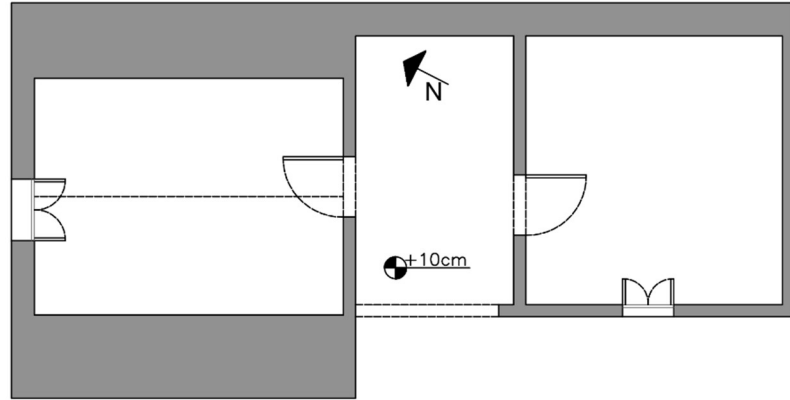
(b): Plan of Haret Jandal Flat Liwan House, Source: Author
